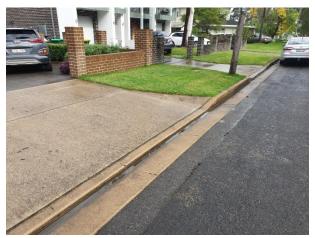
Existing condition of driveway to No. 15 (facing west)
